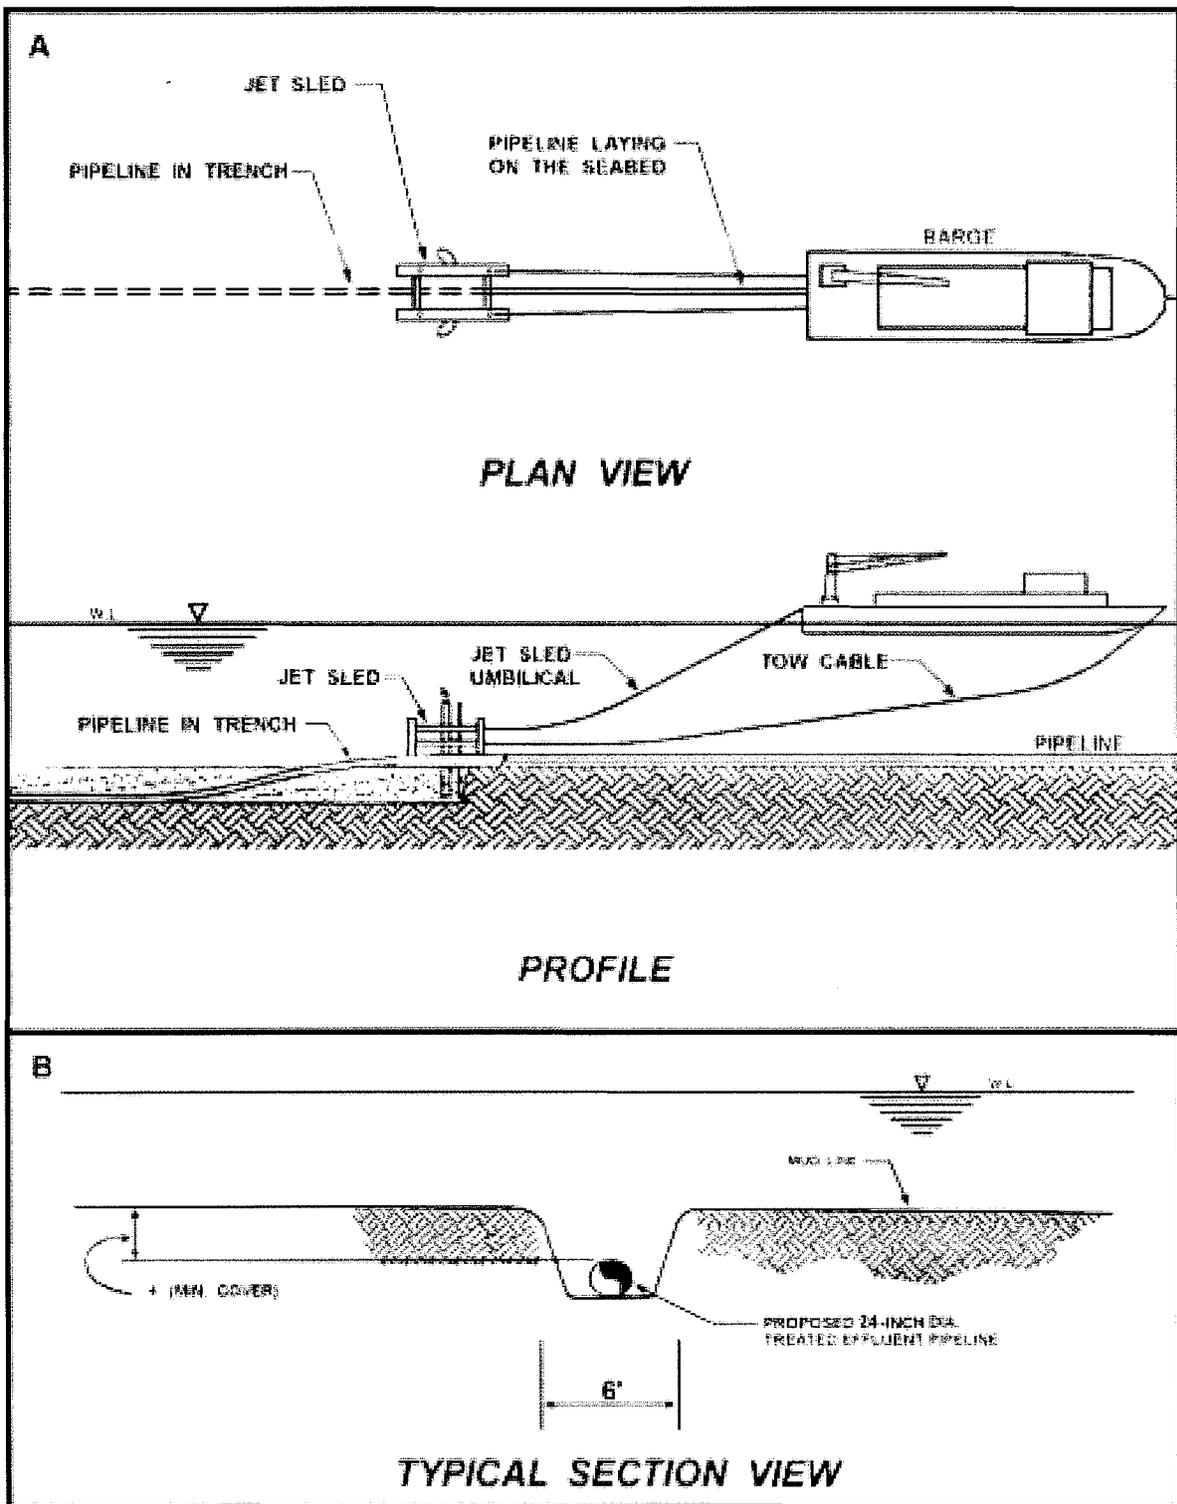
A) Typical pipe-laying barge operation and B) typical trench section configuration.
